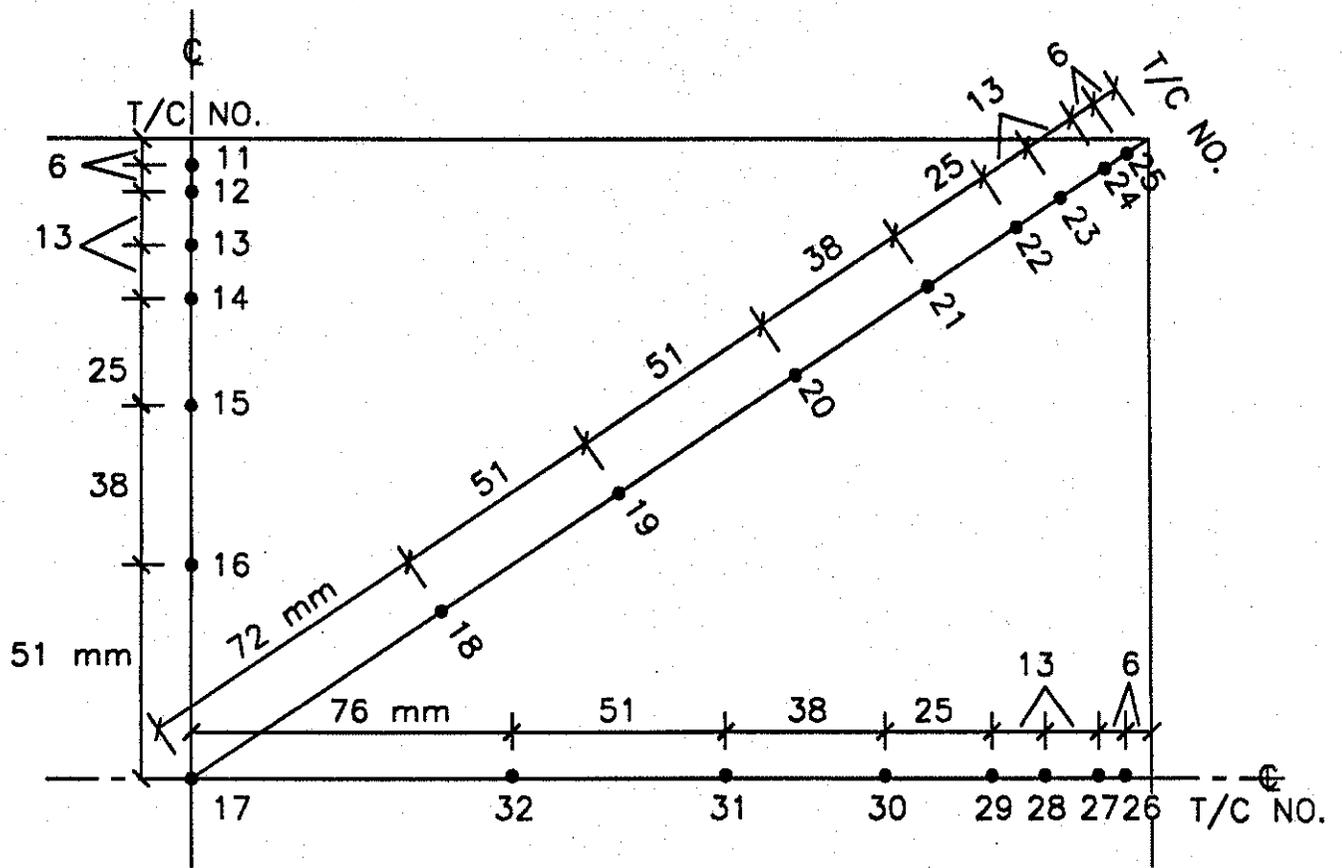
LOCATIONS OF T/C'S IN FRAMES: COLUMN NO. 3
